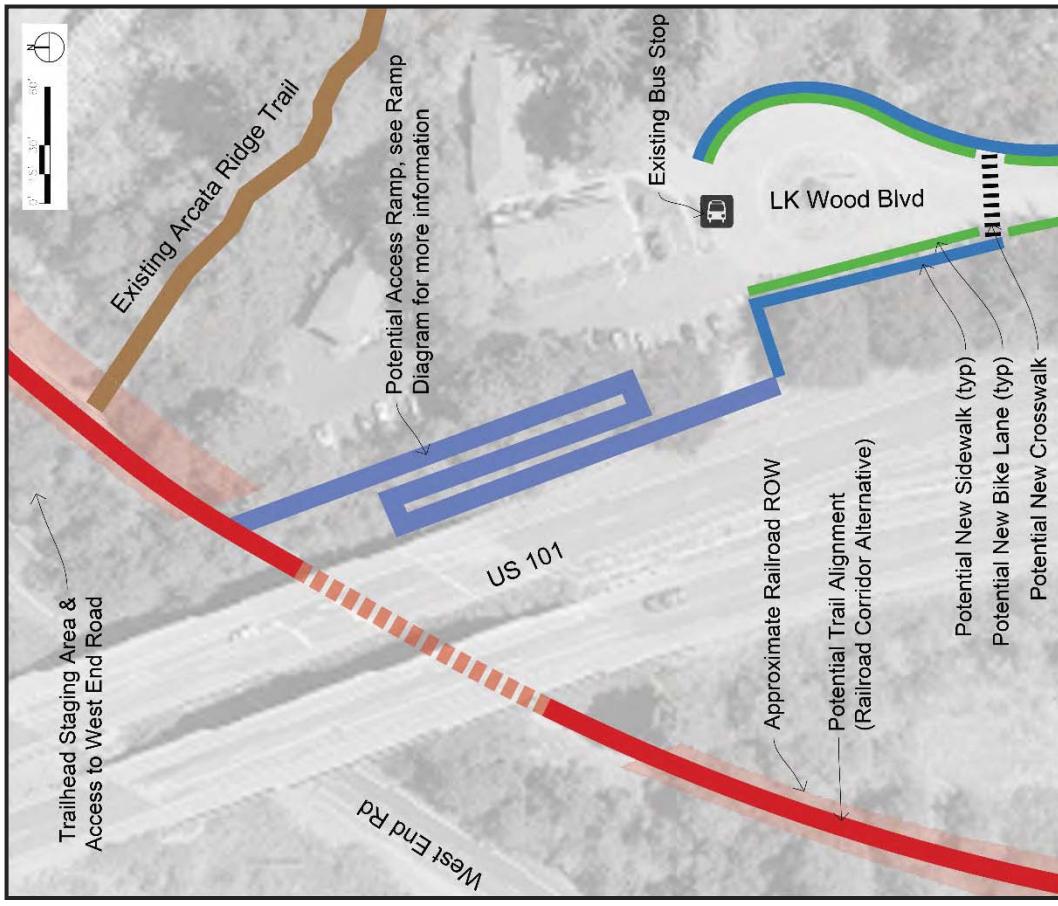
Ramp & Stair Access Diagrams for LK Wood Boulevard & West End Road Area
